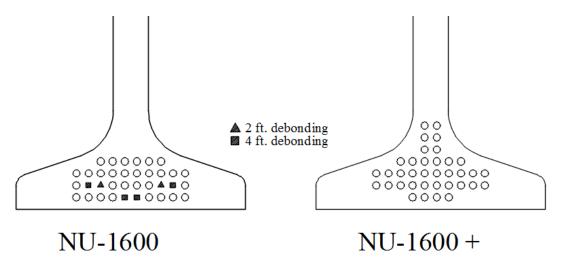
NU-1600 Girder Straight or Debond Design with Span Length of 110 ft
